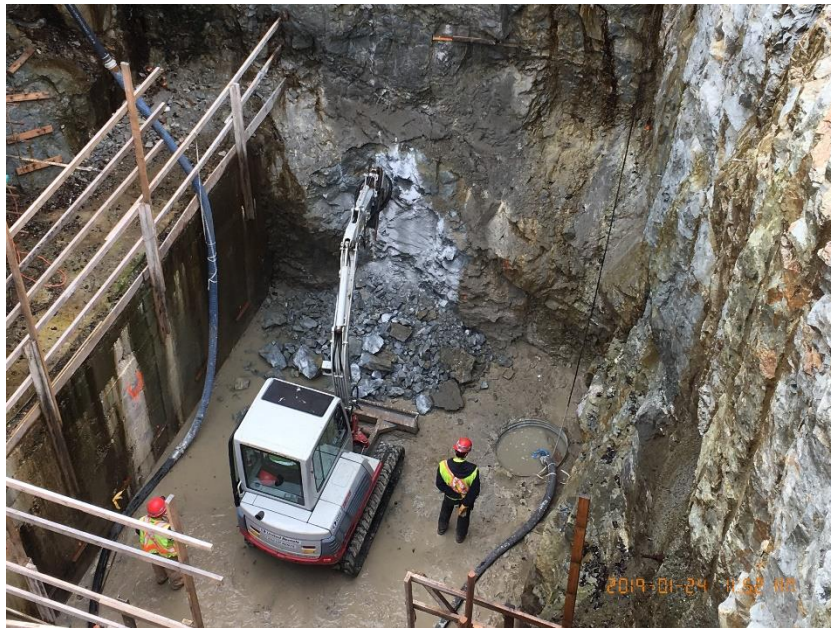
McLoughlin Point Wastewater Treatment Plant: chipping rock face at micro tunnel boring machine (MTBM) entry point.
